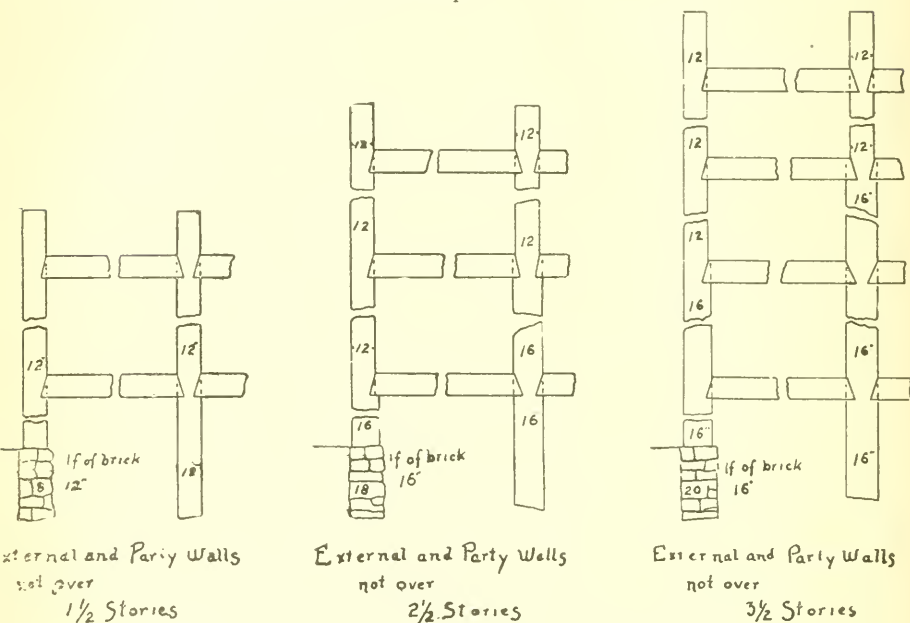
BRICK BUILDINGS OTHER THAN DWELLINGS.
